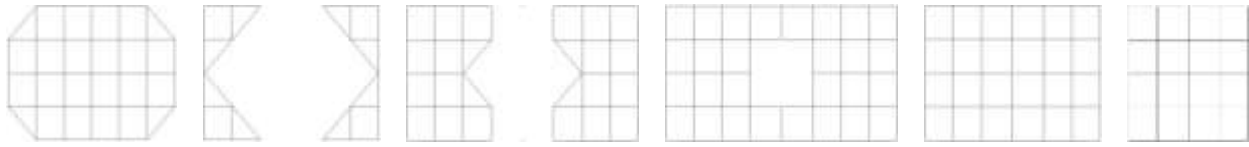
plan geometry for seven-story EDMMC; from left to right: underground 2, 1 and ground floor, mechanical floor, second floor, third floor, fourth floor, roof
